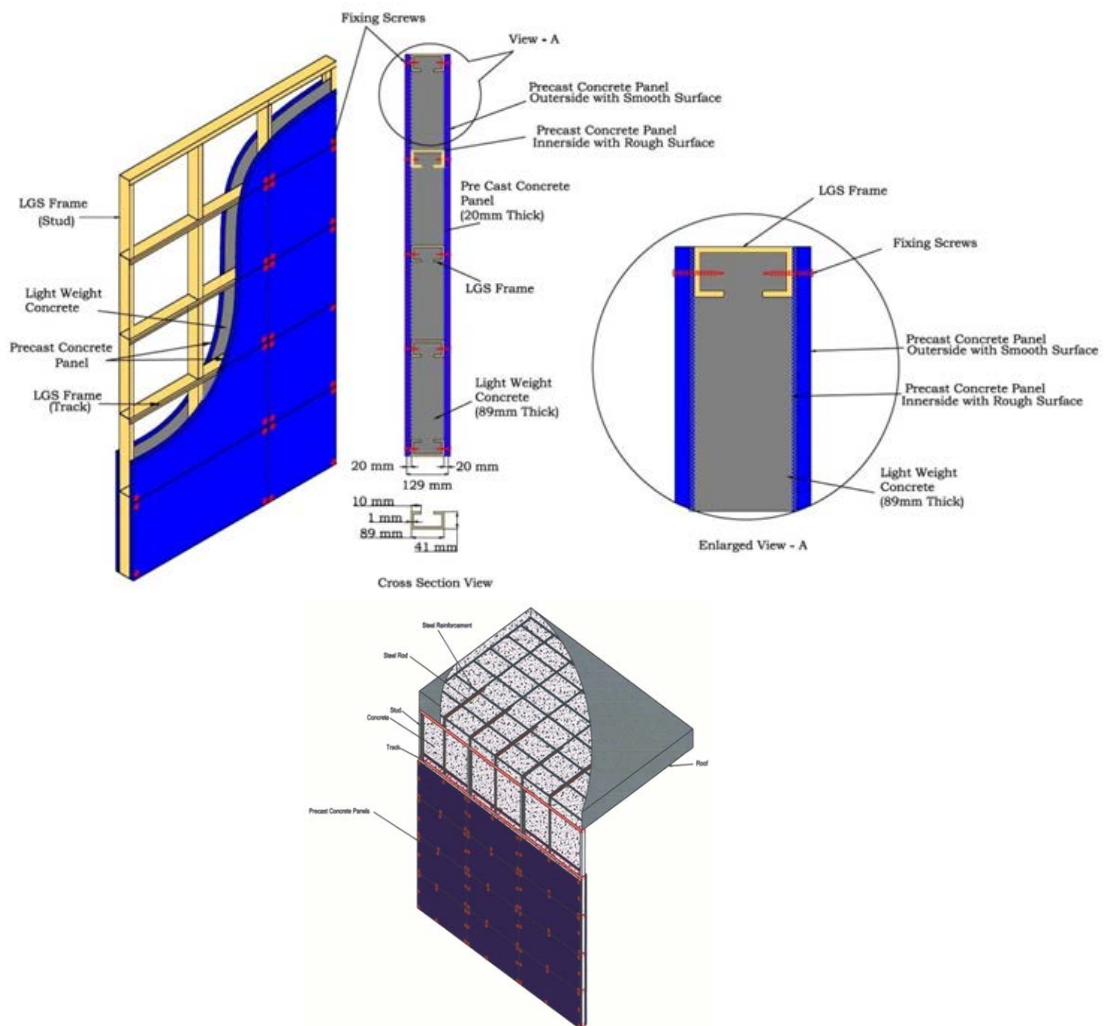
Structural Details of LGSFS-Infill Concrete Wall.
